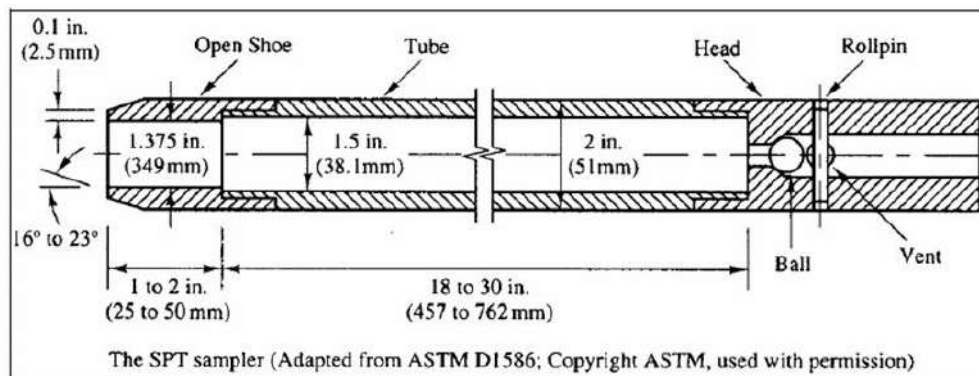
Standard dimensions for the SPT sampler, as given in ASTM D1586.
